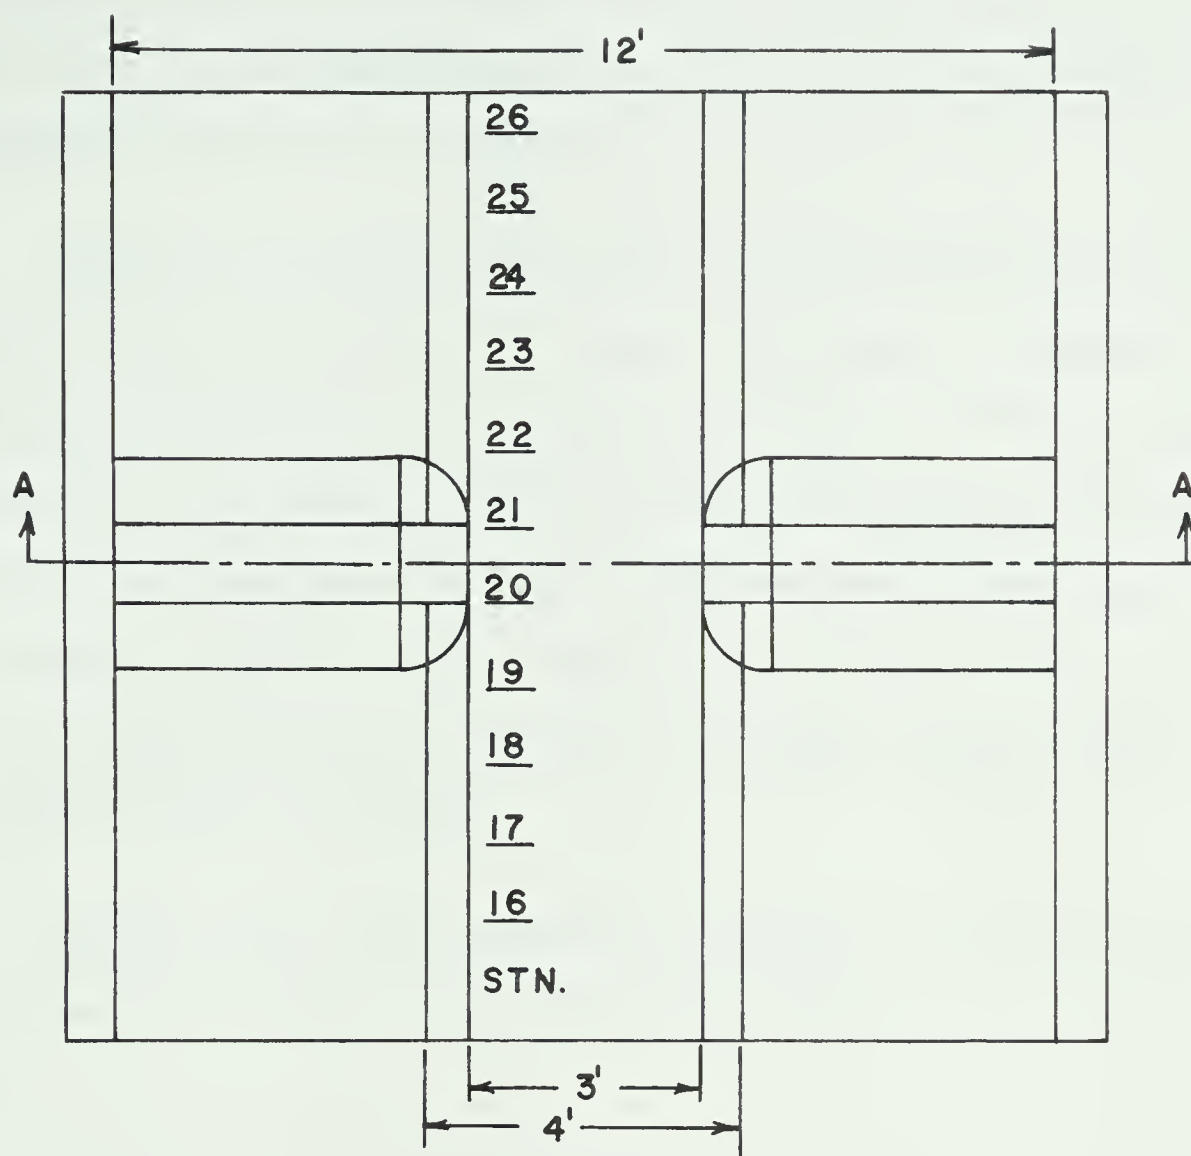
LAYOUT OF MODEL EMBANKMENT
